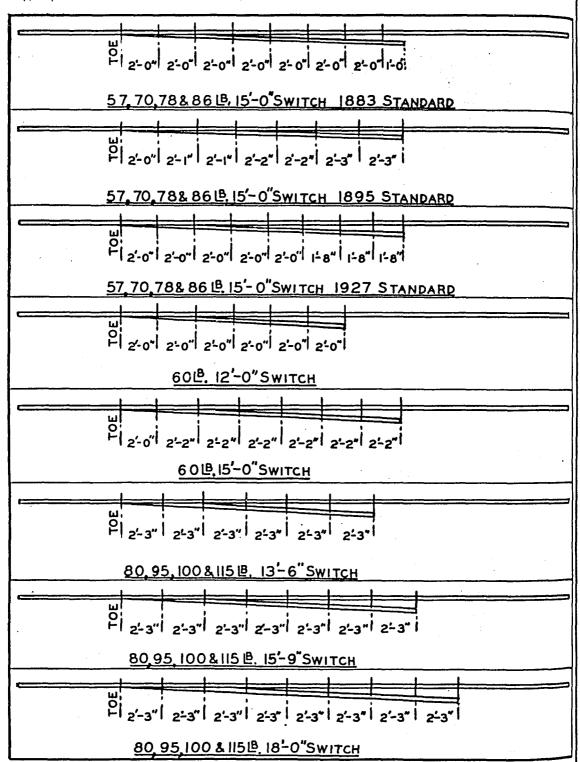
SPACING OF CHAIR PINS & BOLTS, X LAYOUT , STOCK RAILS.
